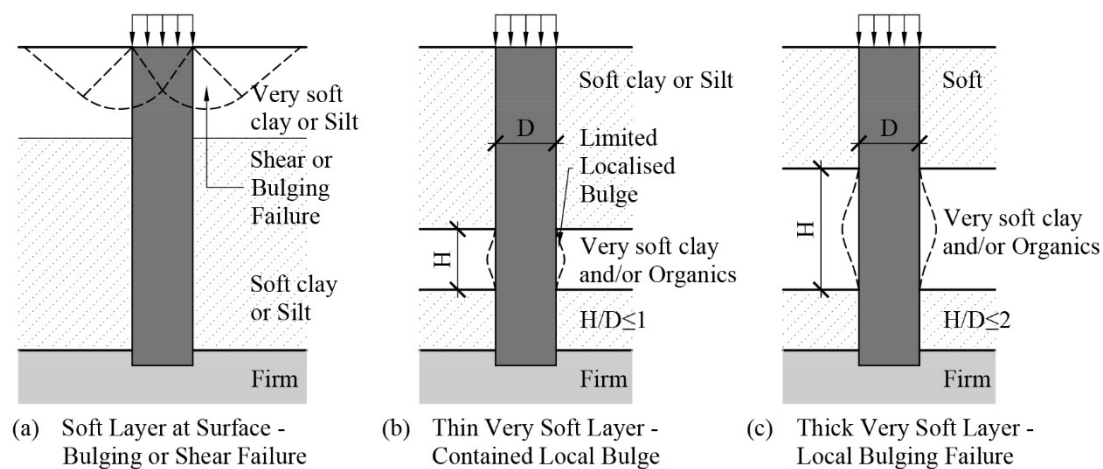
Failure mechanism of a single column in a non-homogeneous soil (adapted from Barksdale & Bachus, 1983)
